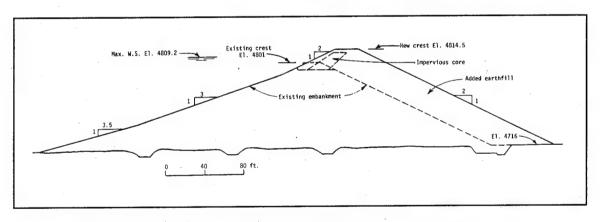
Conventional method of raising dam crest elevation, Lake Sherburne Dam
